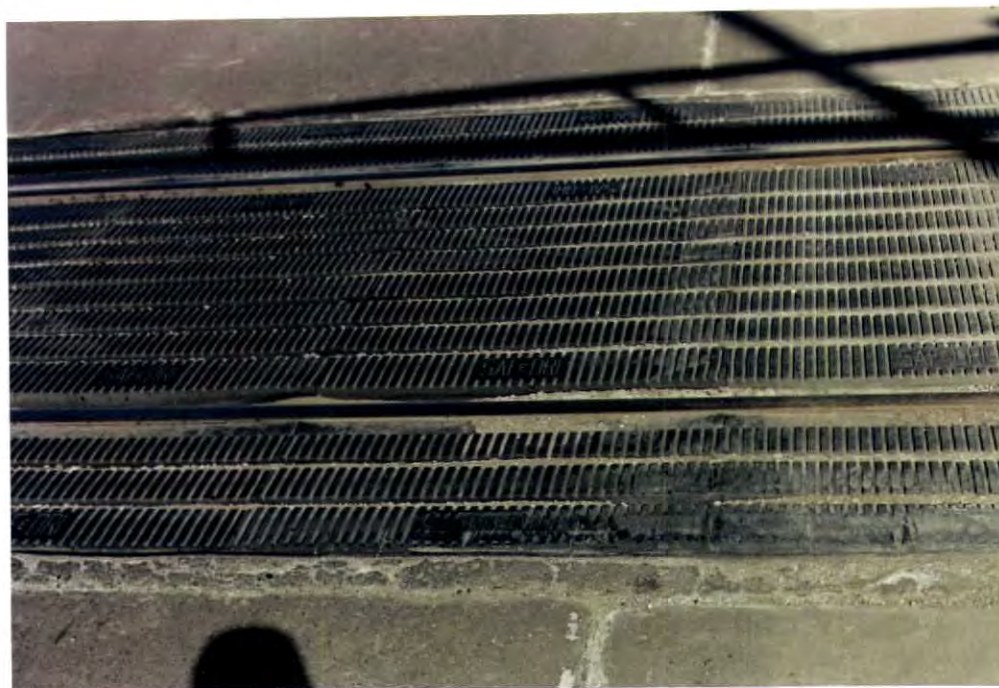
Minnesota Avenue - Worn and Damaged Panels
